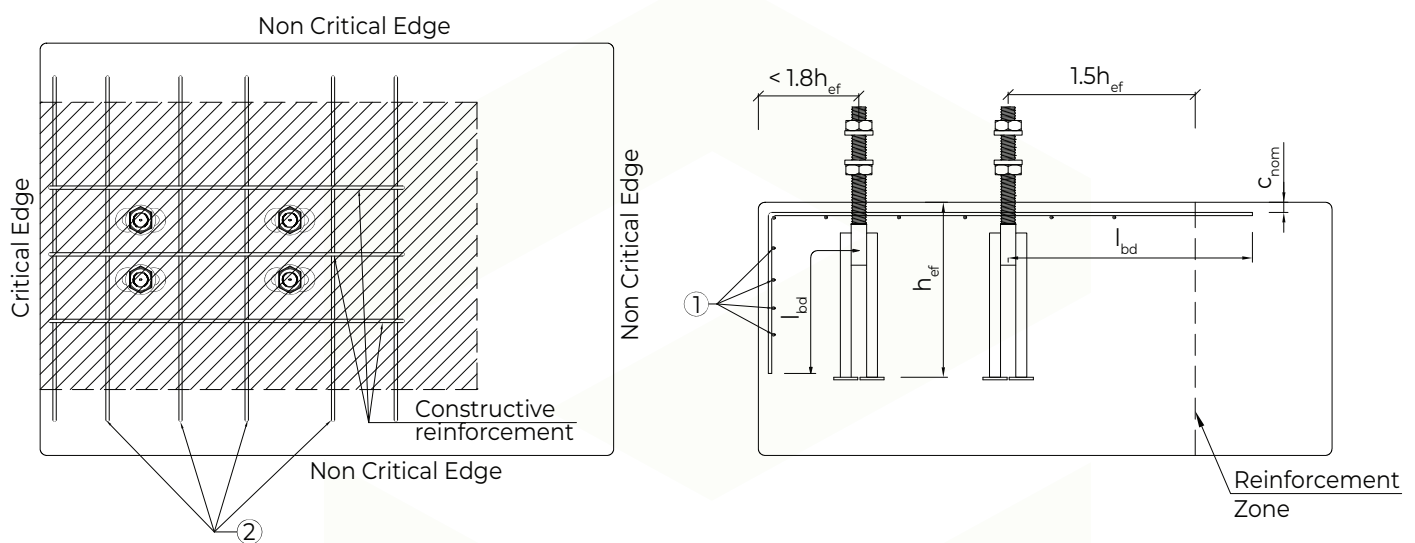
(Concrete Splitting Reinforcement for ESB-S)
